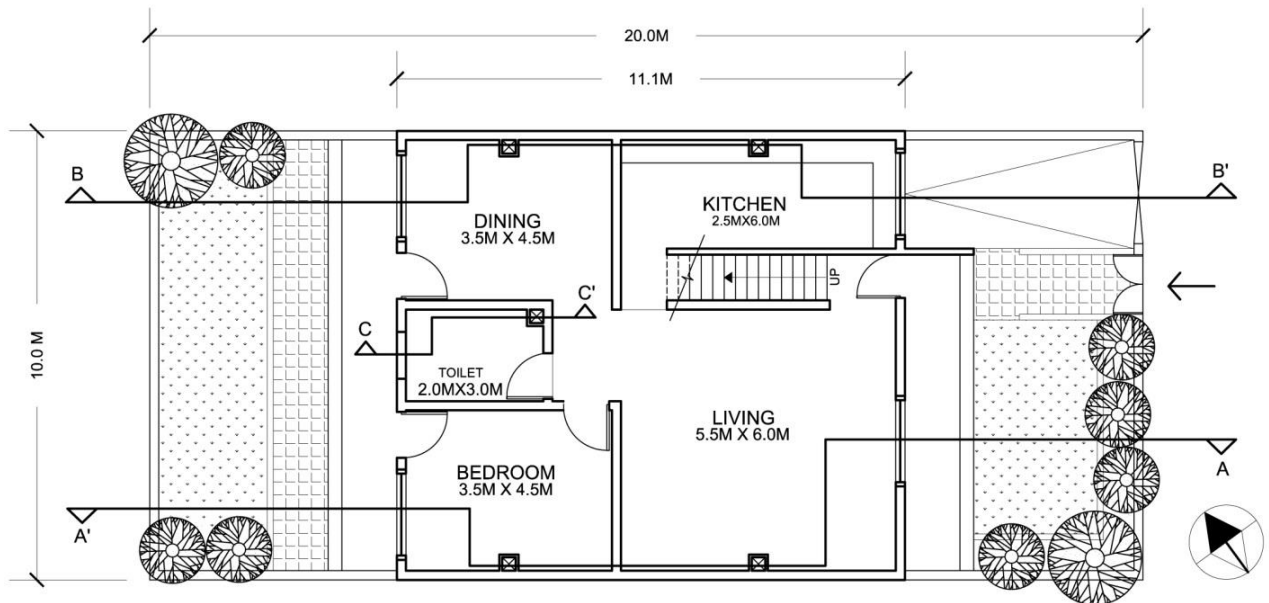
GROUND FLOOR PLAN OF THE RESIDENCE
